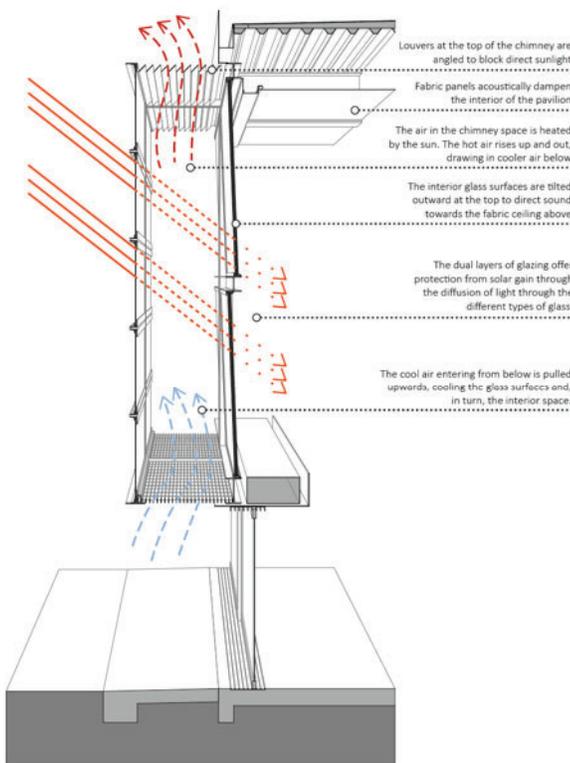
Wall section of the Prayer Pavilion of Light by Debartolo Architects
